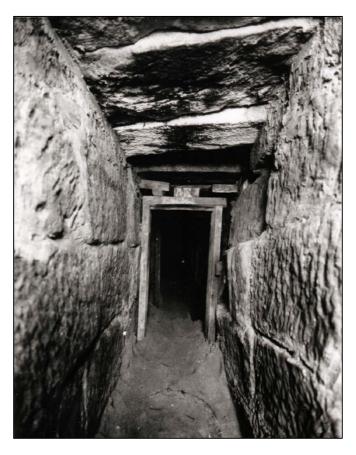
SECTION OF BUSBY'S BORE NEAR INTERSECTION OF LIVERPOOL AND COLLEGE STREETS, THIS SECTION OF THE BORE WAS CONSTRUCTED AS AN OPEN CUT TRENCH, LAID WITH SANDSTONE MASONRY AND SLAB ROOF (SOURCE: SYDNEY WATER ARCHIVES, REF: A1029)
